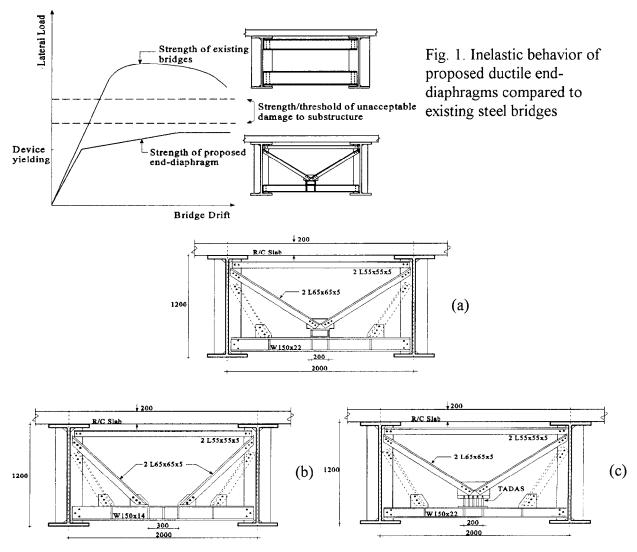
Proposed ductile end-diaphragm of a typical bridge: a) SPS, b) EBF, c) TADAS
